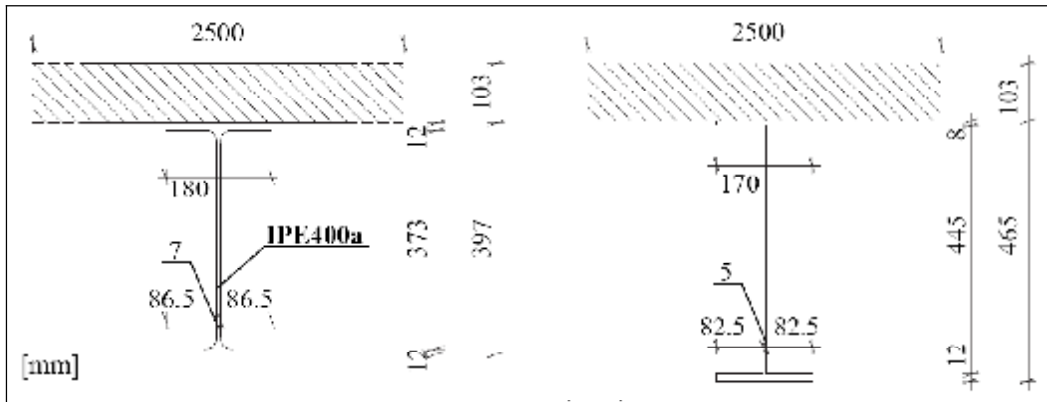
Dimensions of composite beam with IPE400a profile (left) and welded profile (right)
